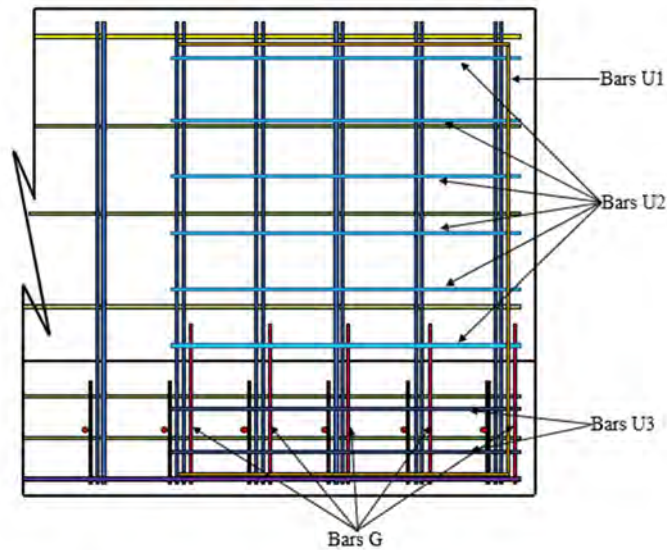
End Face Elevation View of 0 Degree ITBC
